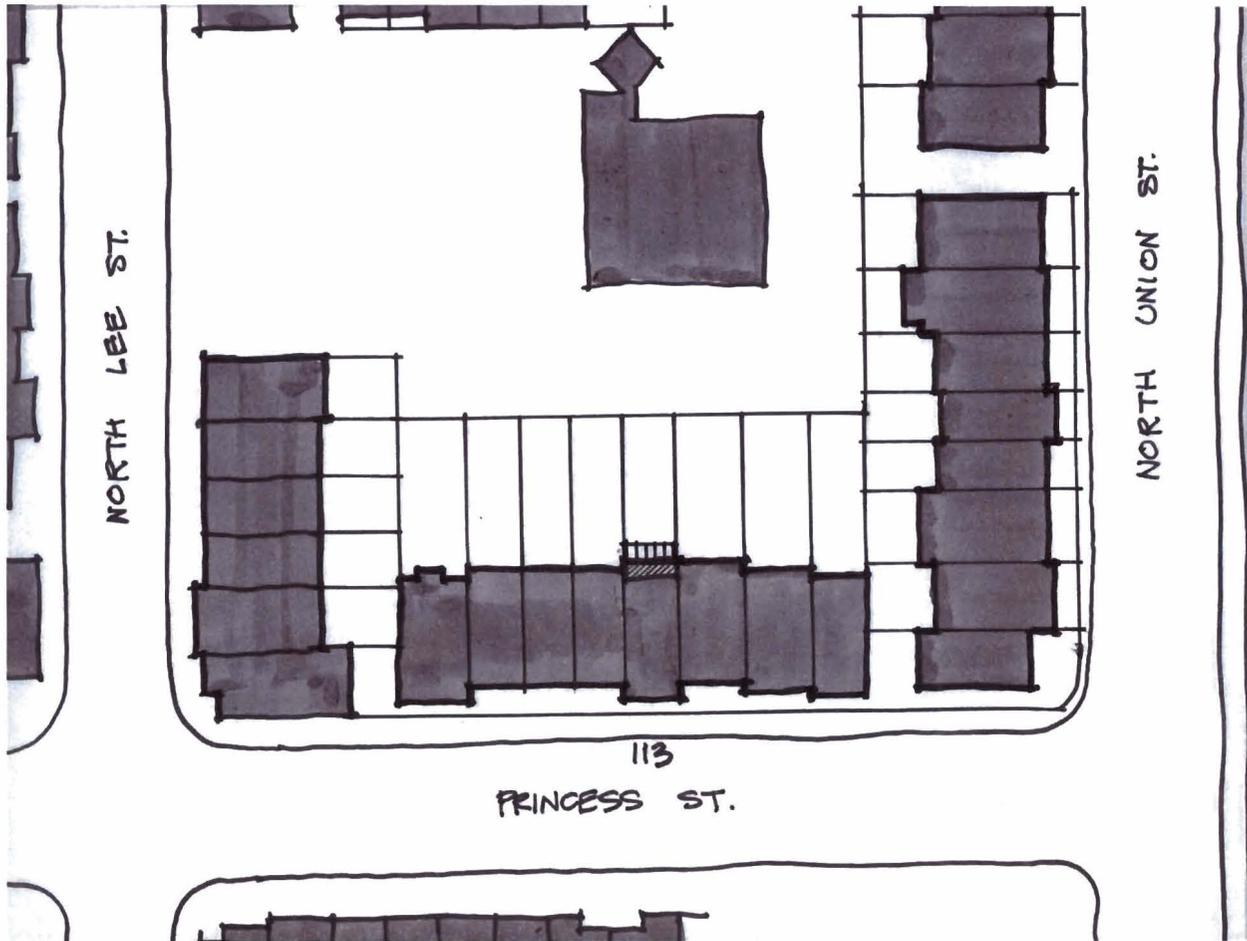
Plan showing proposed 113 Princess first and second level rear additions and surrounding neighborhood
